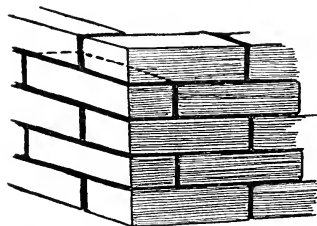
Diagram of a corner of a brick wall to show (in dotted lines) a quoin binder
